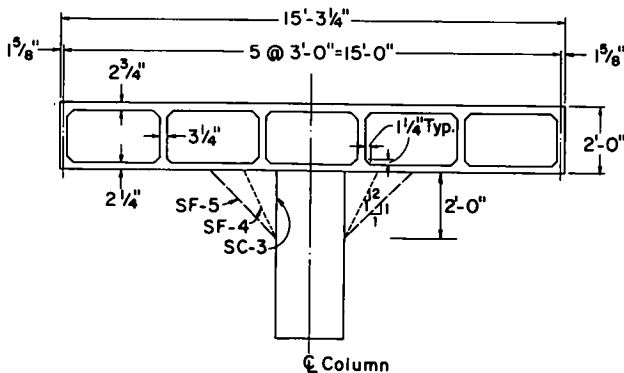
Cross sections of single-column bents SC-3, SF-4, and SF-5.
